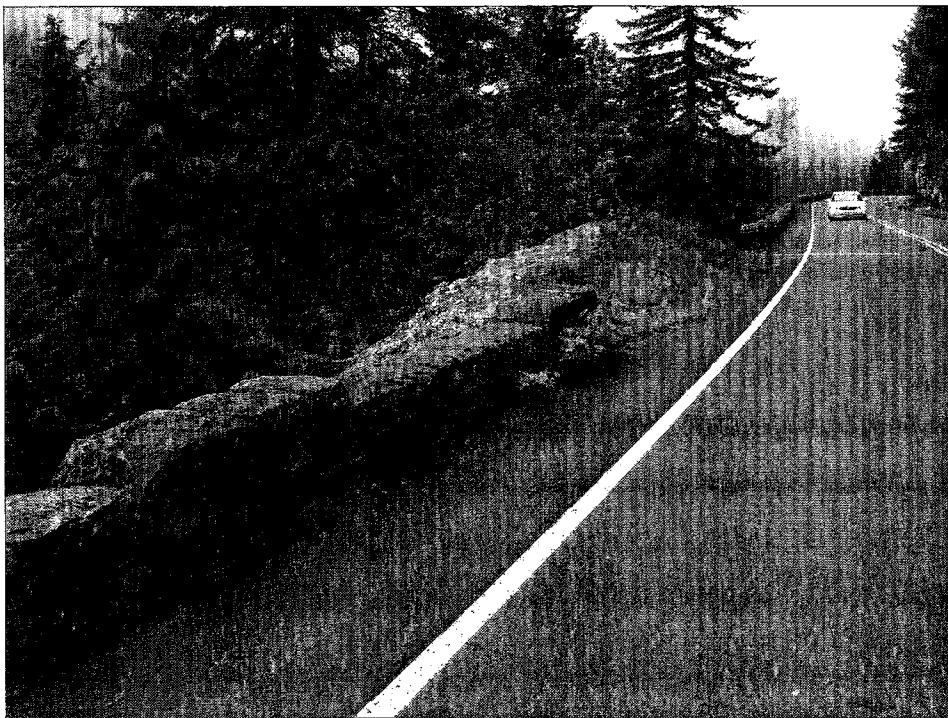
Contemporary photo showing contributing Type 2 guardwall with berm between guardwalls (MORA 2004).
